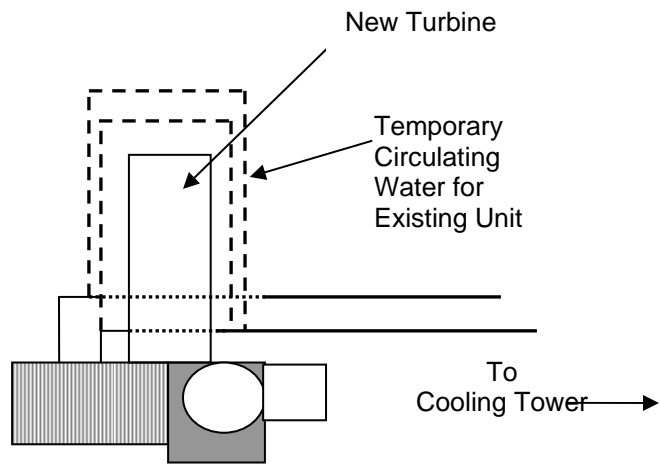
Calloway Circulating Water Reroute (Rerouting will be plant specific)
